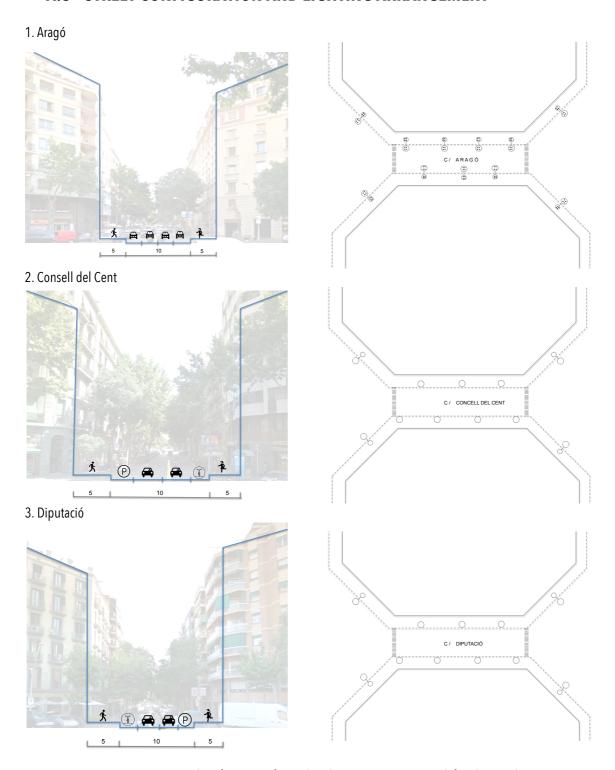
Examples of one span for analyzed streets: street section (left), plans (right).
